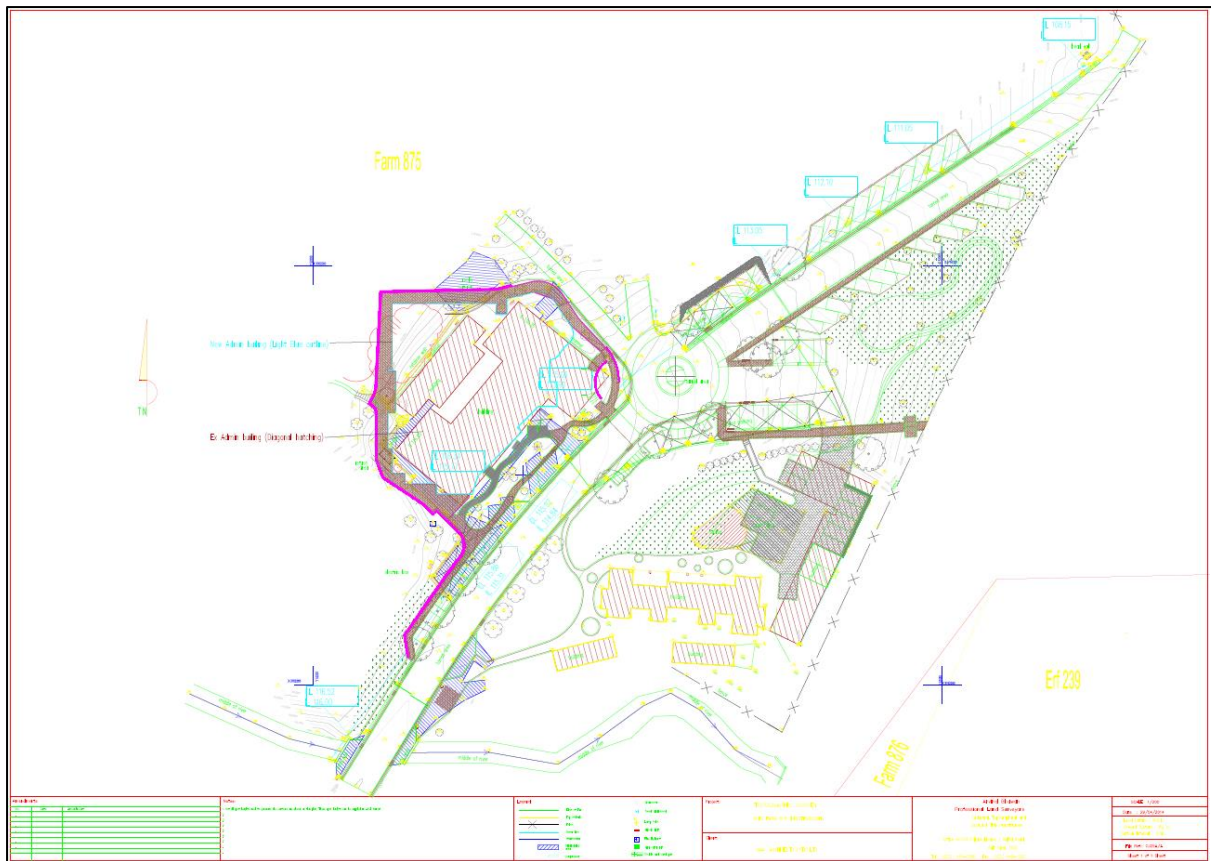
Plan of proposed Scheme 2, indicating new position of building which is more sympathetic to the site. The building has been moved 3m west and 1m north. Existing prefab buildings are indicated by brown diagonal hatch. Proposed new building is outlined in turquoise. (Source VMA Architects)
